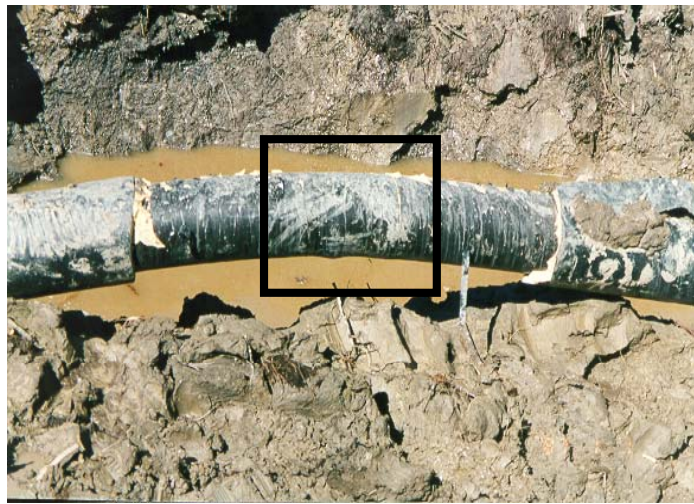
Upheaval and Buckle/Wrinkle at Excavation Site
